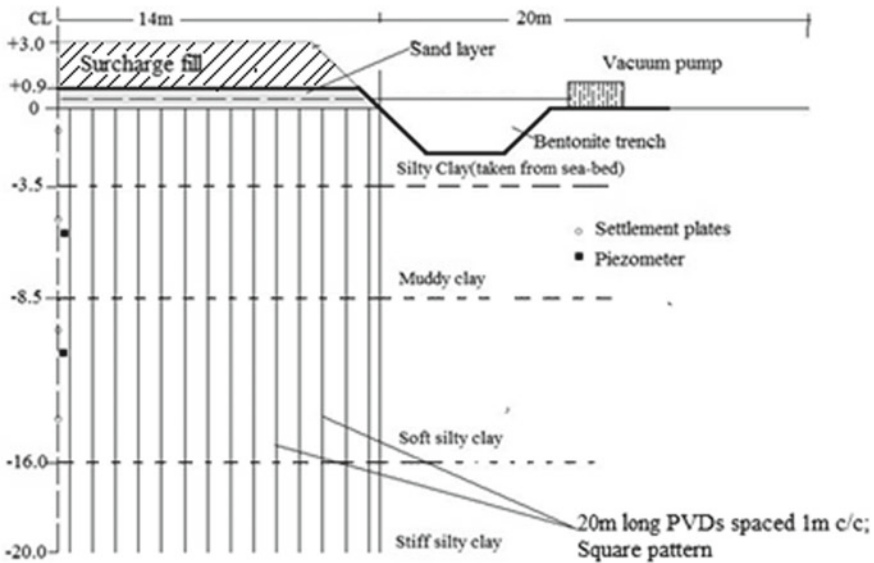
Cross section of test embankment with subsoil profile for Section III, Tianjin Port, Beijing [18]
